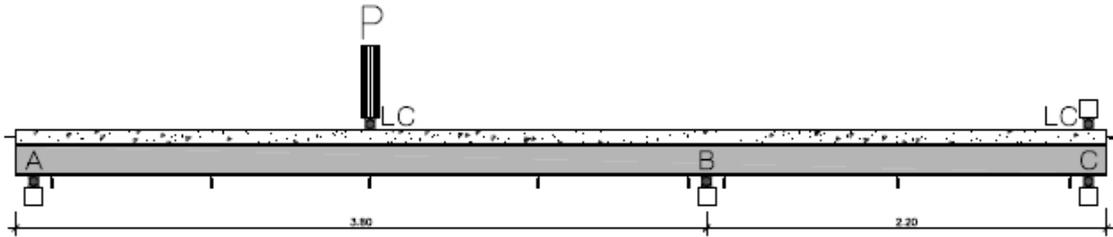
The middle of span loading of restrained steel-concrete composite beams.
